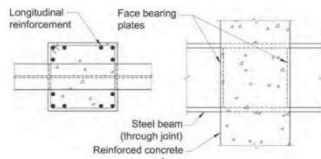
Reinforced concrete column-to-steel beam moment connection.
